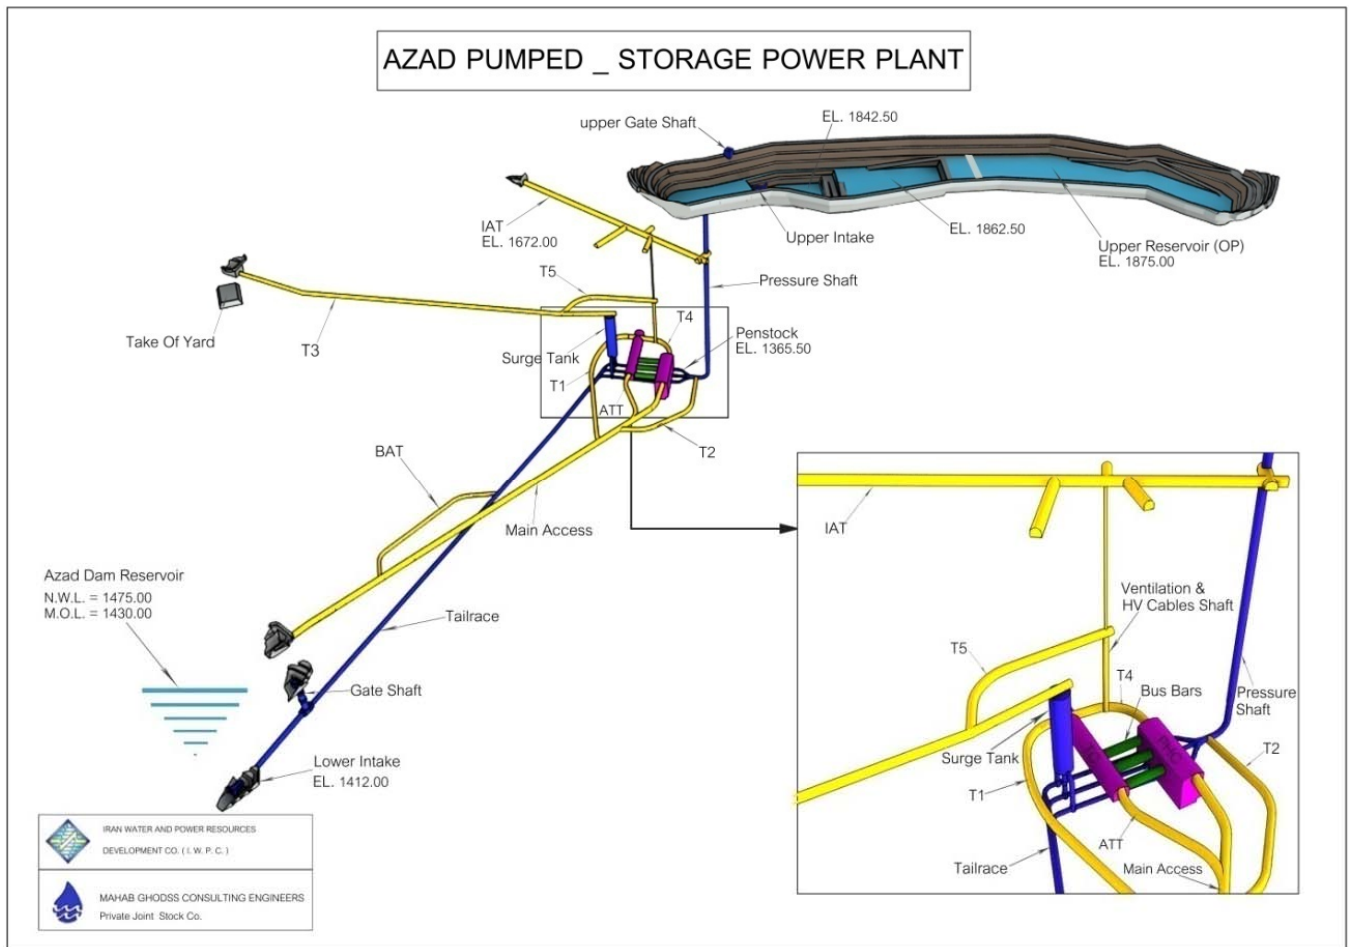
Position of water tunnel on Sanandaj Azad Dam [6]
